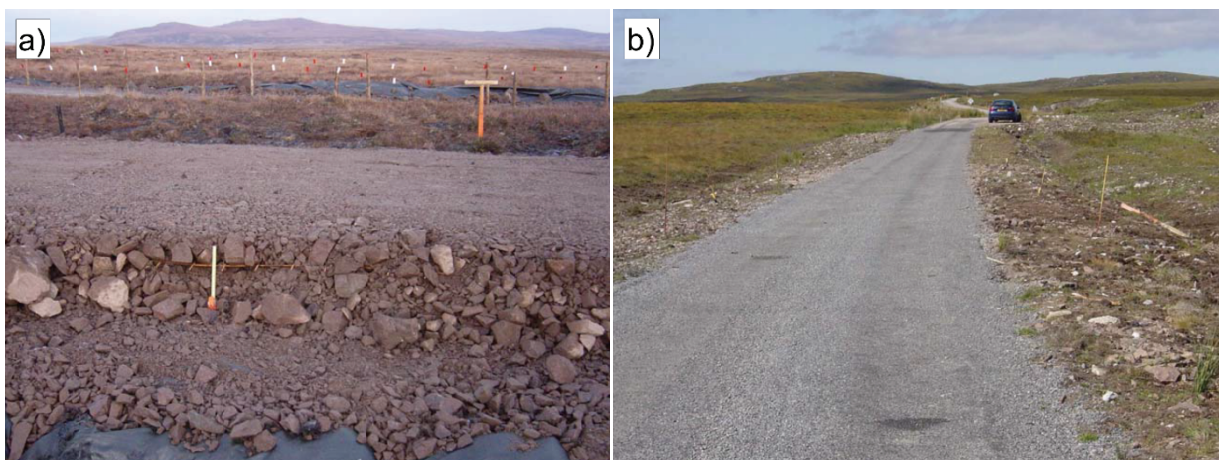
Tyre bales in the B-871 road foundation, Scotland: a) rockfill layer topped over tyre bales; steel reinforcement installed in the subgrade; b) the B-871 road after completion of pavement [18]
